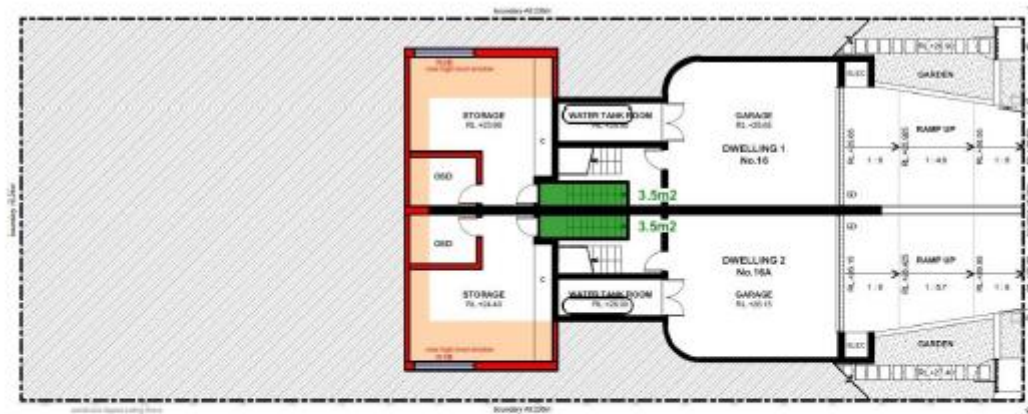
Lower Ground Floor GFA Calculation Plan (GFA: 7m²)
